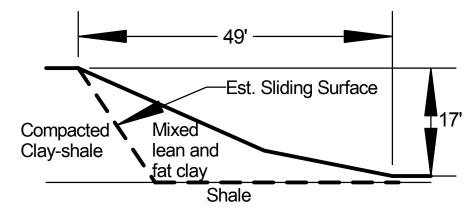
Assumed design cross-section for I435-Holmes Road slope.
